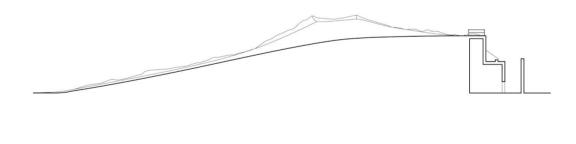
Abandoned bunker, existing site plan. Produced by the author.
